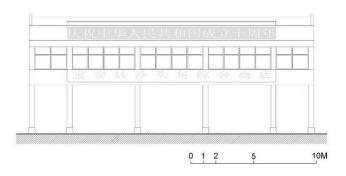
Elevation of No. 4 Arcade Building (Speculated) in the 1950s
